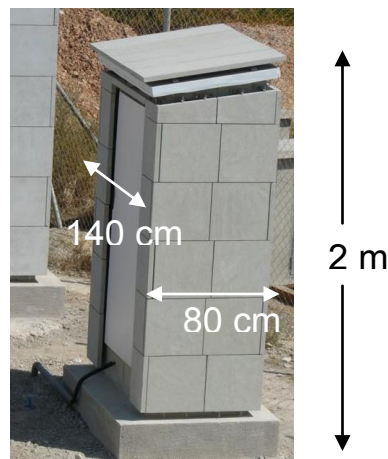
Pilot station made of concrete and Bateig Azul as natural stone for the façade.
